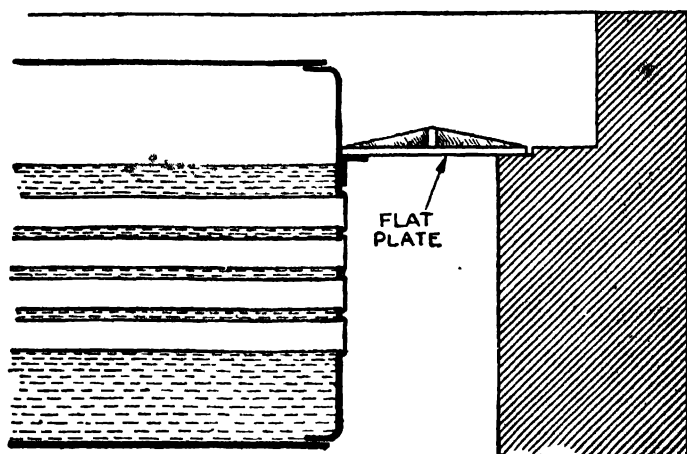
,395 —Flat plate back connections. This construction affords easy access to the back end of the boiler and plenty of light but is objectionable in that *the metal is not protected from the heat.
